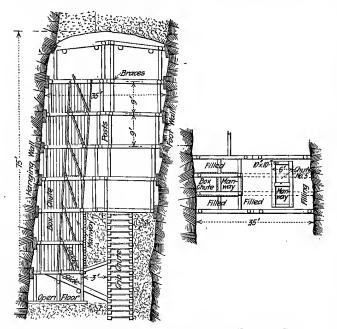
SECTION AND PLAN OF CENTRAL TRENCH SHOWING METHOD OF CARRYING UP CRIBBED CHUTE AND FILLING
